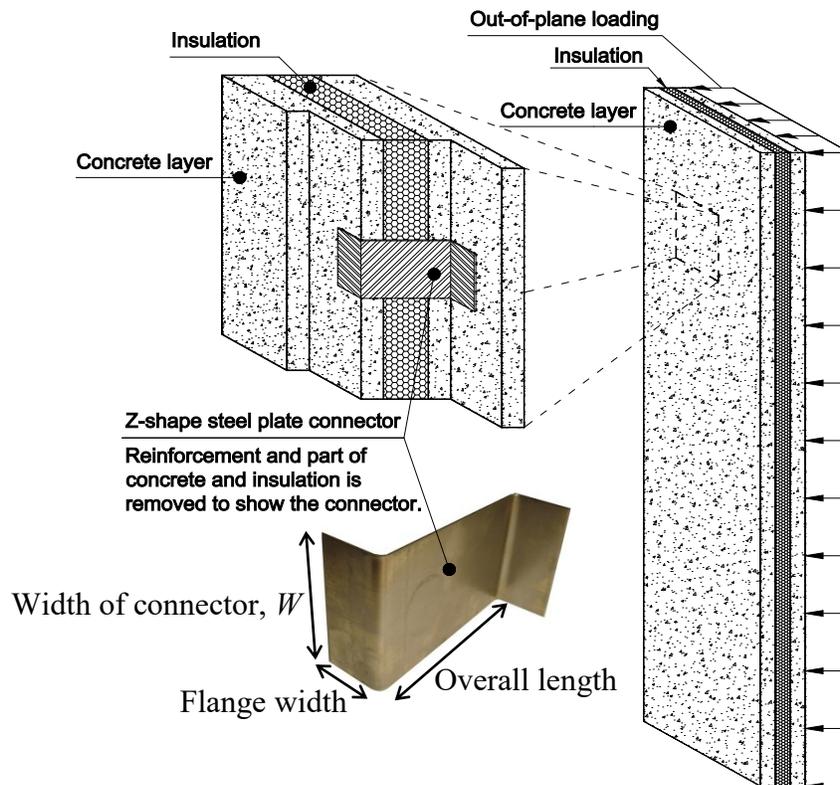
Schematic of Z-shaped connectors used in precast concrete panels.
